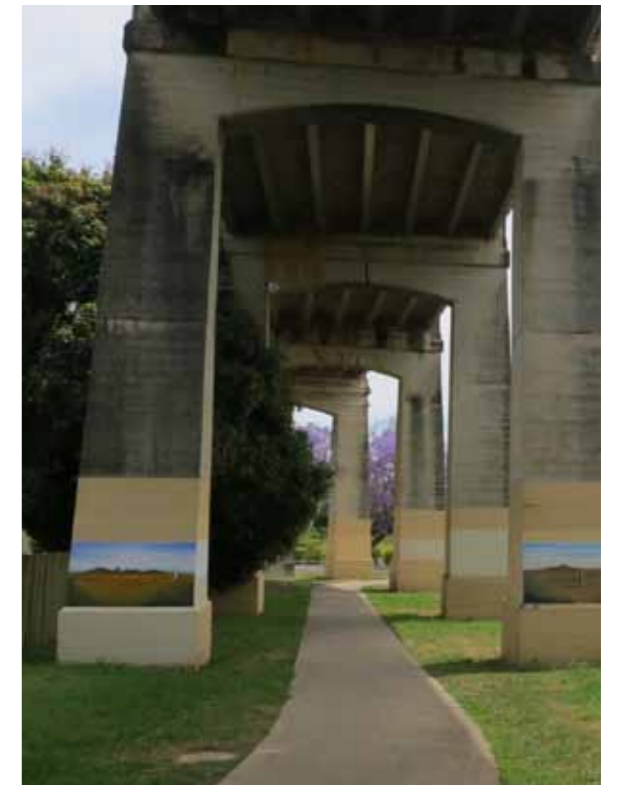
Managed art / graffiti art on existing viaduct piers
